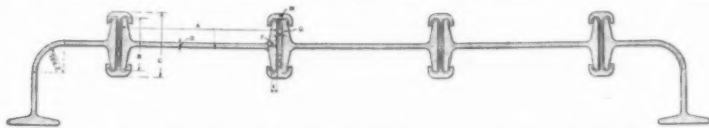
JONES & LAUGHLIN SHEET PILING IN SECTIONS.
